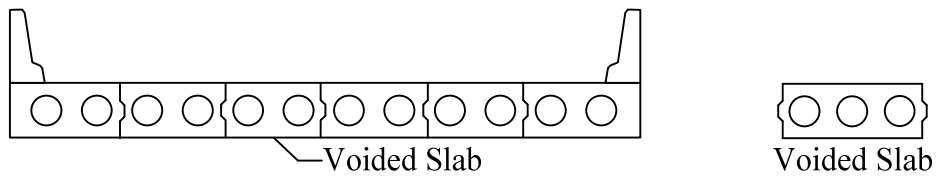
PS CONCRETE VOIDED SLAB
